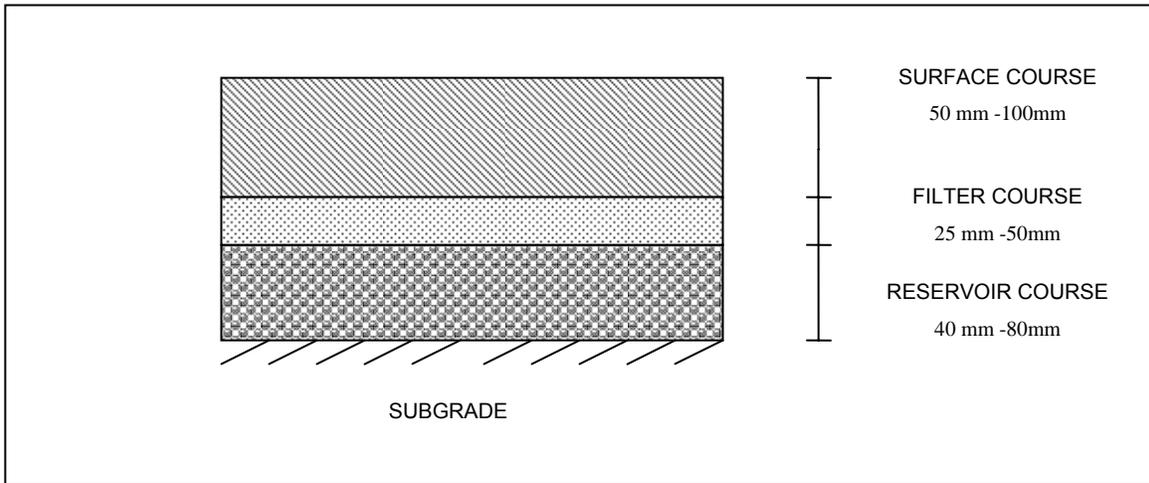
Recommended Porous Asphalt Pavement Structure
